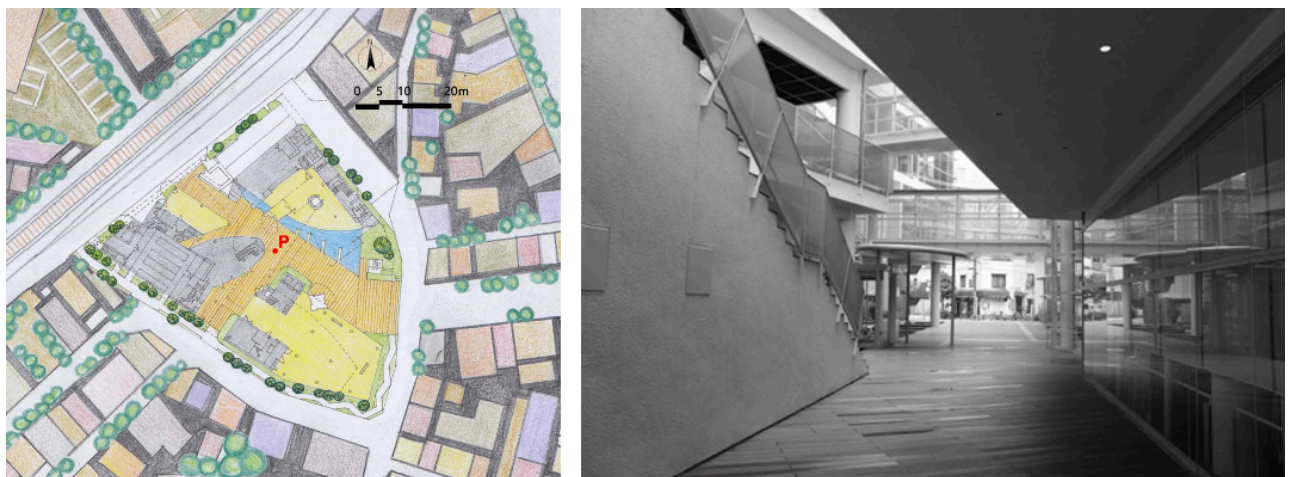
The central plaza (P). (Source from: drawing and photo from the author)
